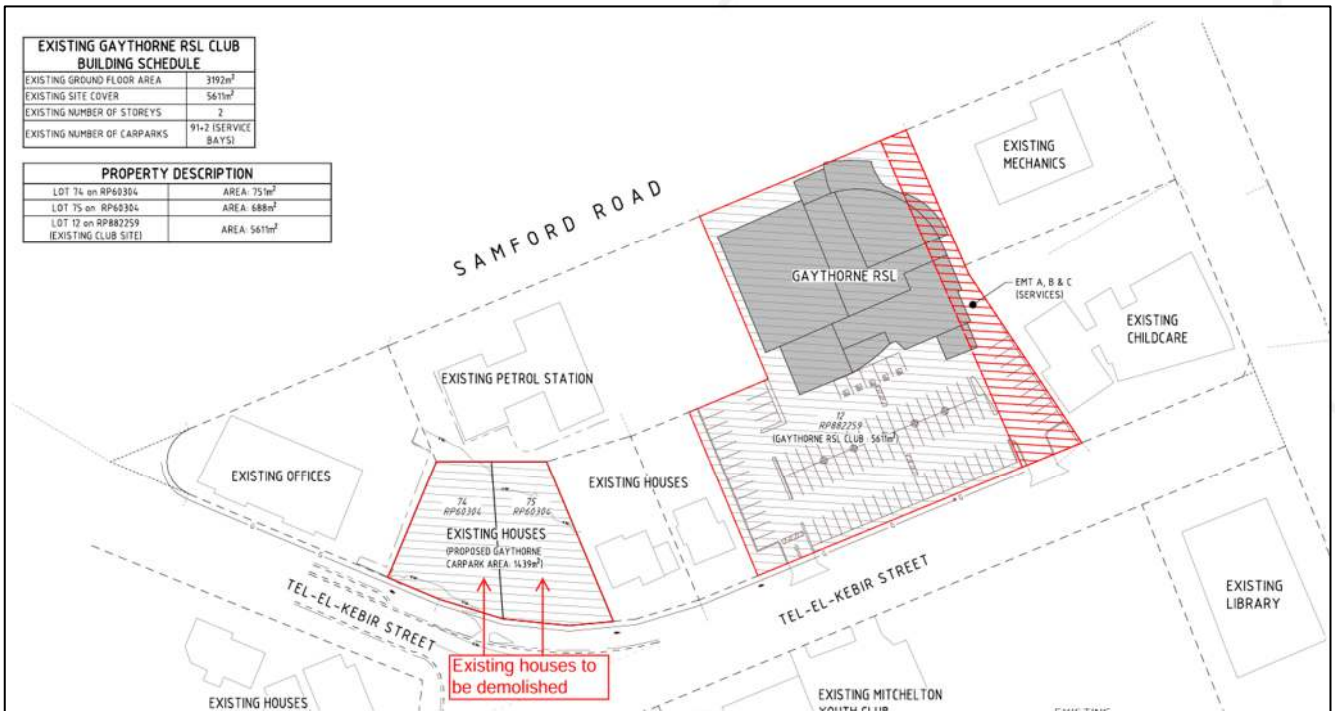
Approved Concept Plan (Source: Developmenti Brisbane)
